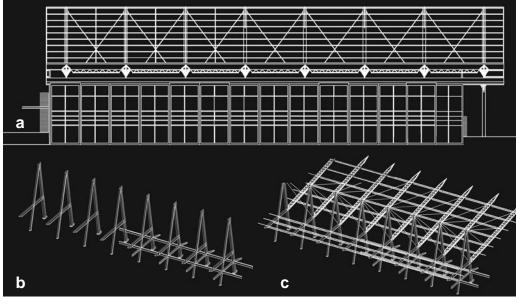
Structure: (a) north elevation, (b) primary frame, and (c) roof.
